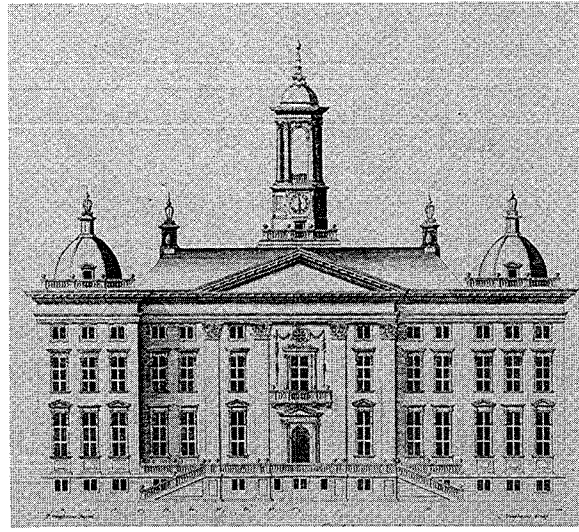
Philips Vingboons, *Elevation, Design for the Town Hall, Amsterdam*, print, 1648, Gemeentearchief, Amsterdam.
